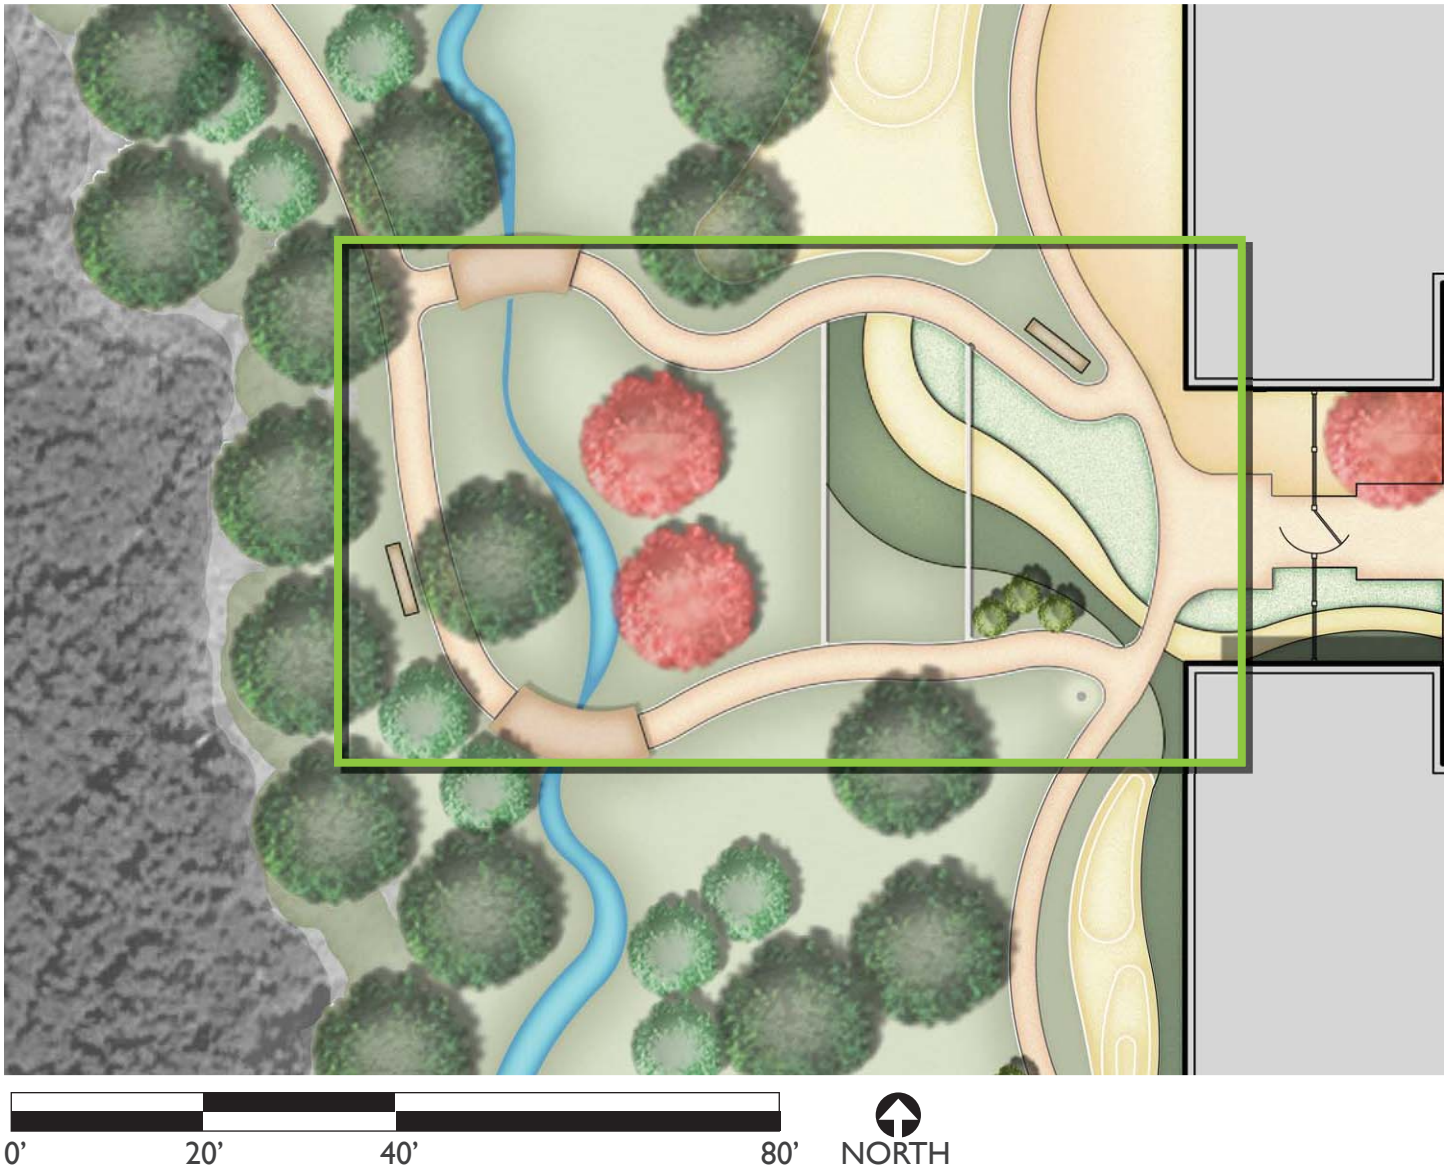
| Nature Walk Blow-up Plan (by author)
